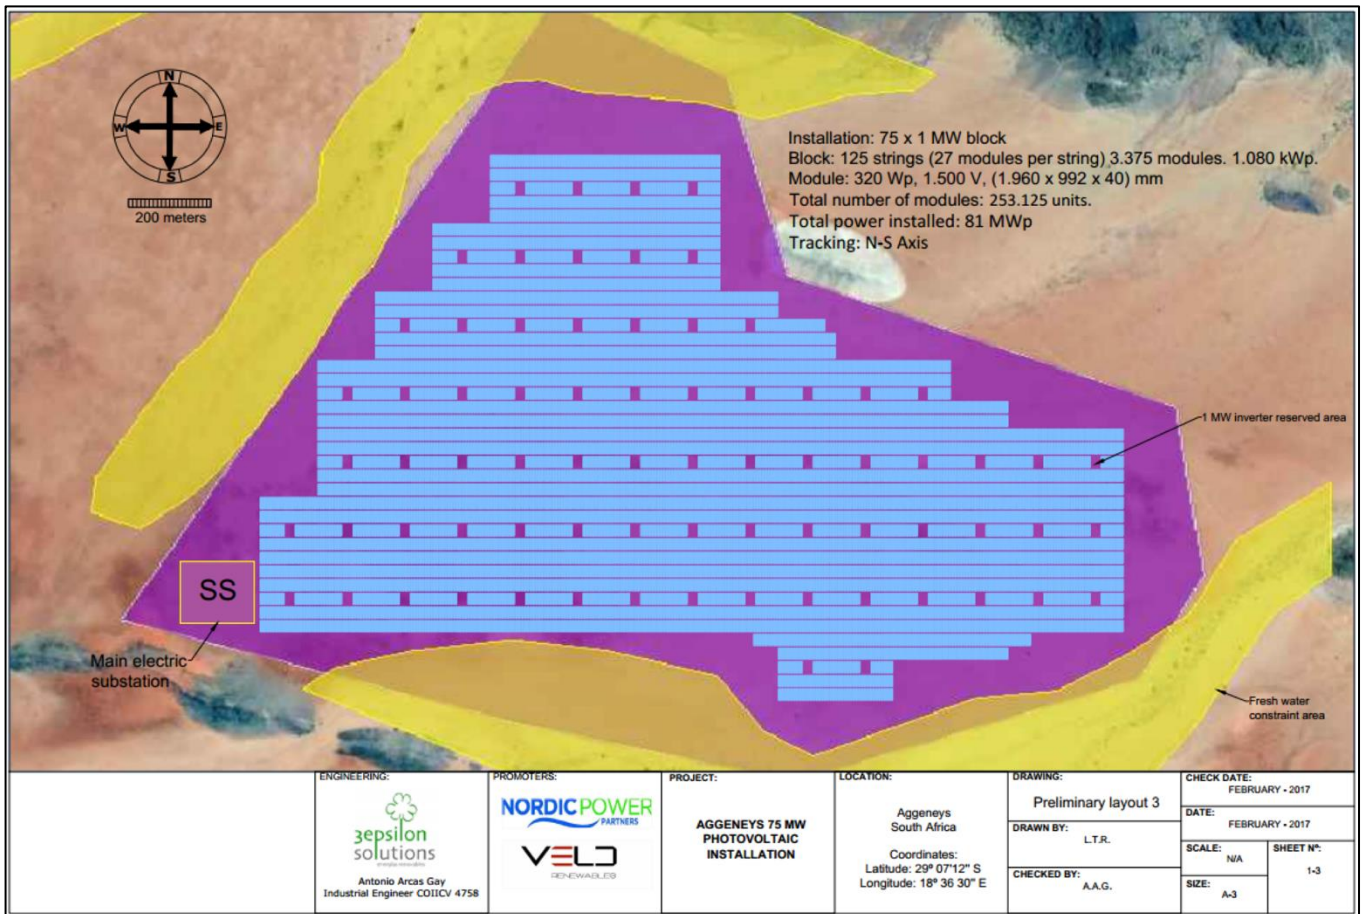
Layout of proposed 75 MW PV installation at Veld PV South.
